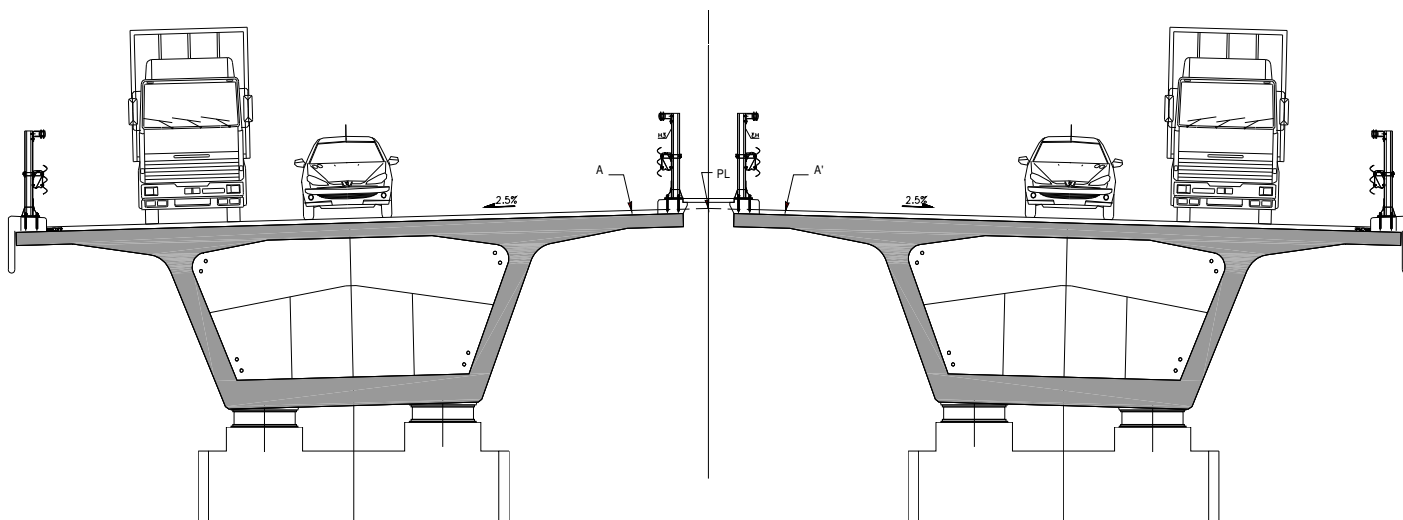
Typical section of constant depth viaducts / Sezione trasversale tipica dei viadotti a sezione costante
